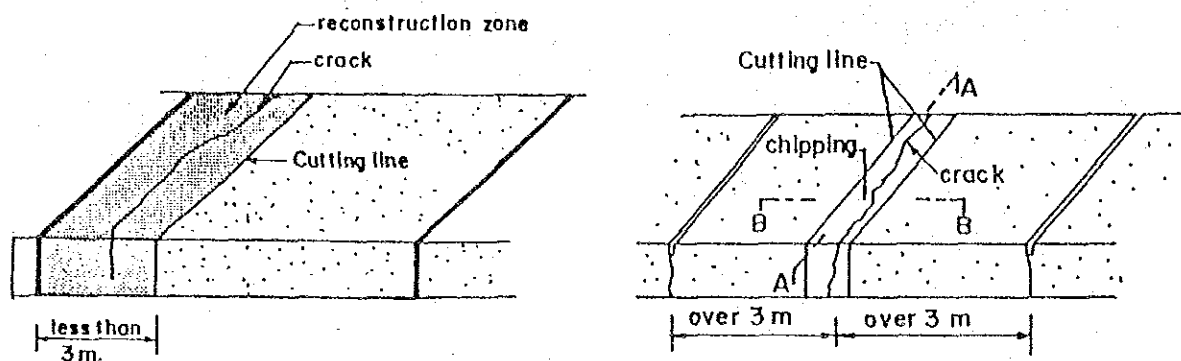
Example of Reconstruction for Transverse Cracking
